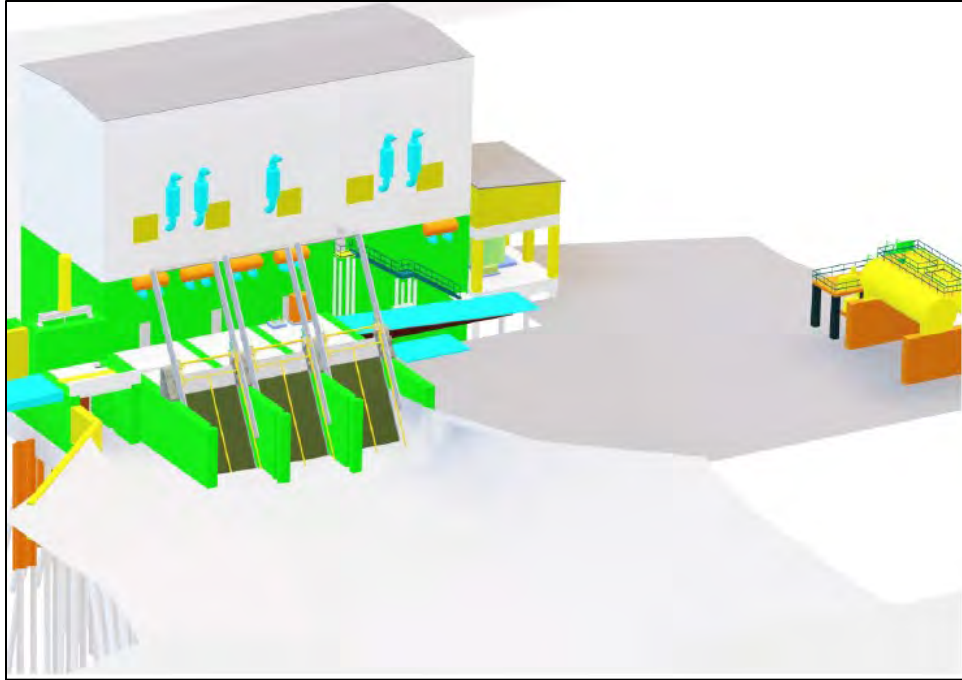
Typical Site Plan of a Pump Station with Small Pumping Capacity
